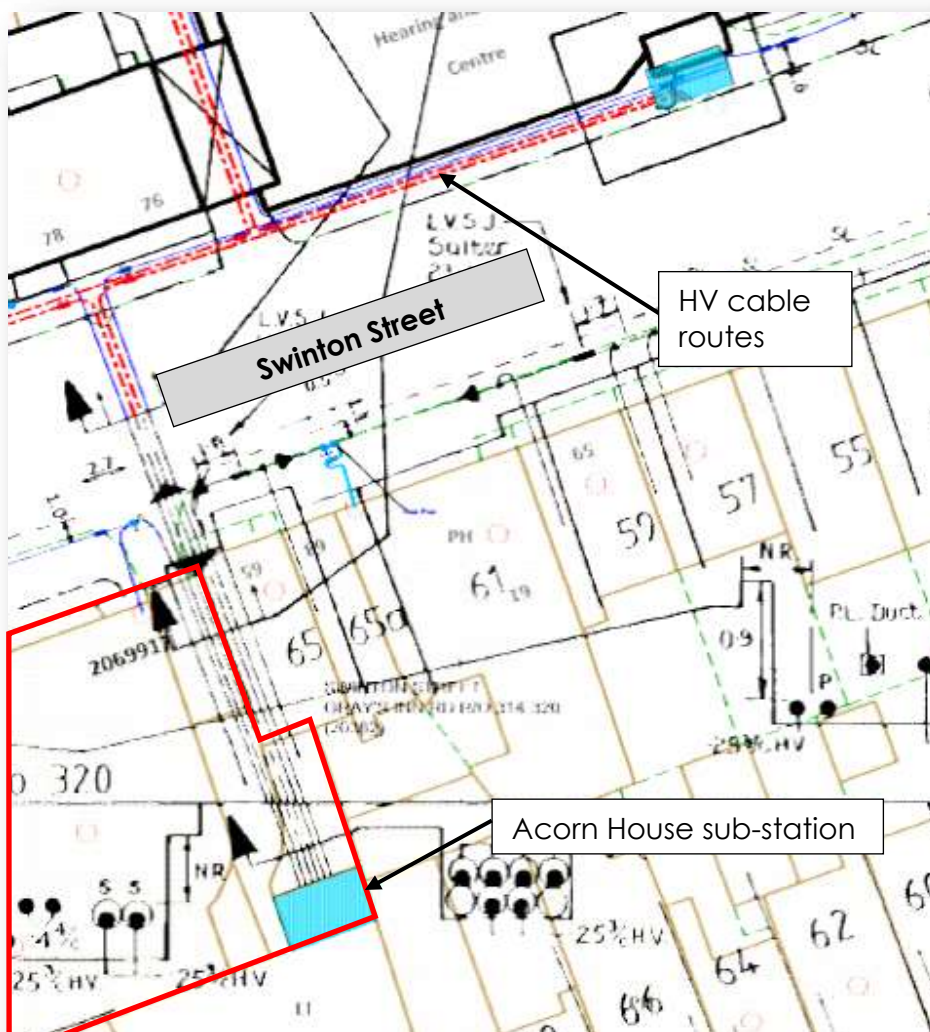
Extract of UKPN local Network Plan indicating cable routes along and across Swinton Street
